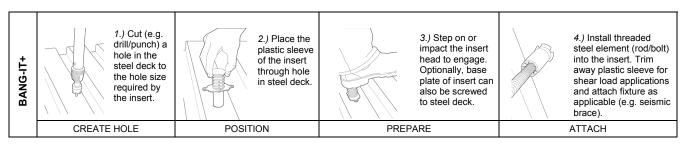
B—BANG-IT+ CONCRETE INSERTS FOR STEEL DECK, MANUFACTUER PUBLISHED INSTALLATION INSTRUCTIONS (MPII)
